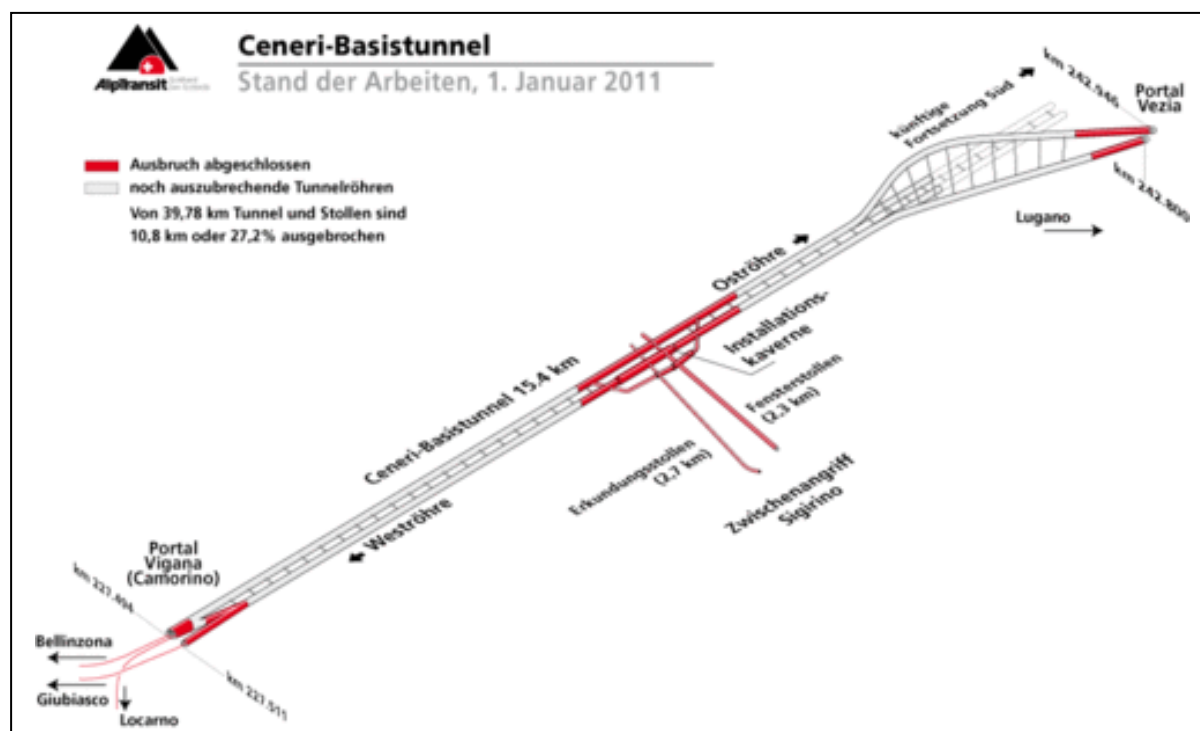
Drilling works at Ceneri Tunnel (01.01.2011)
